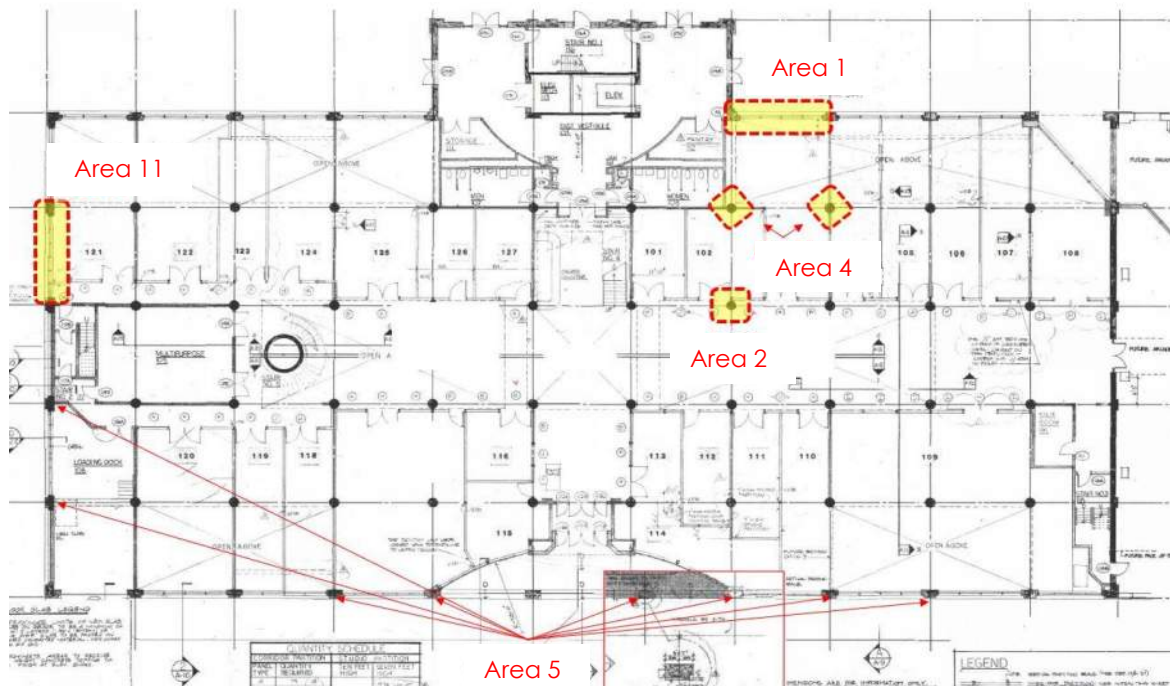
Ground Floor Plan – Showing Areas 1, 2, 10 & 11 Assessed by CBZ
